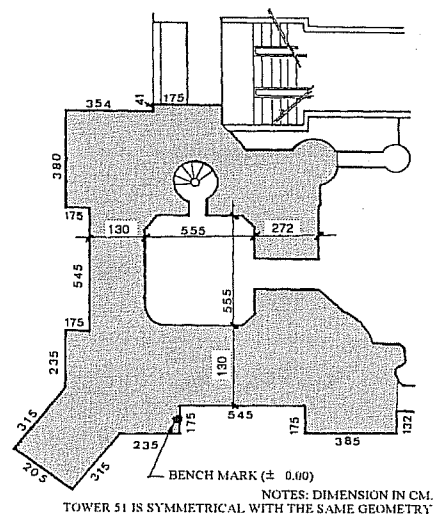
SECTION TOWER 53 (AT ELEVATION + 4.35)
